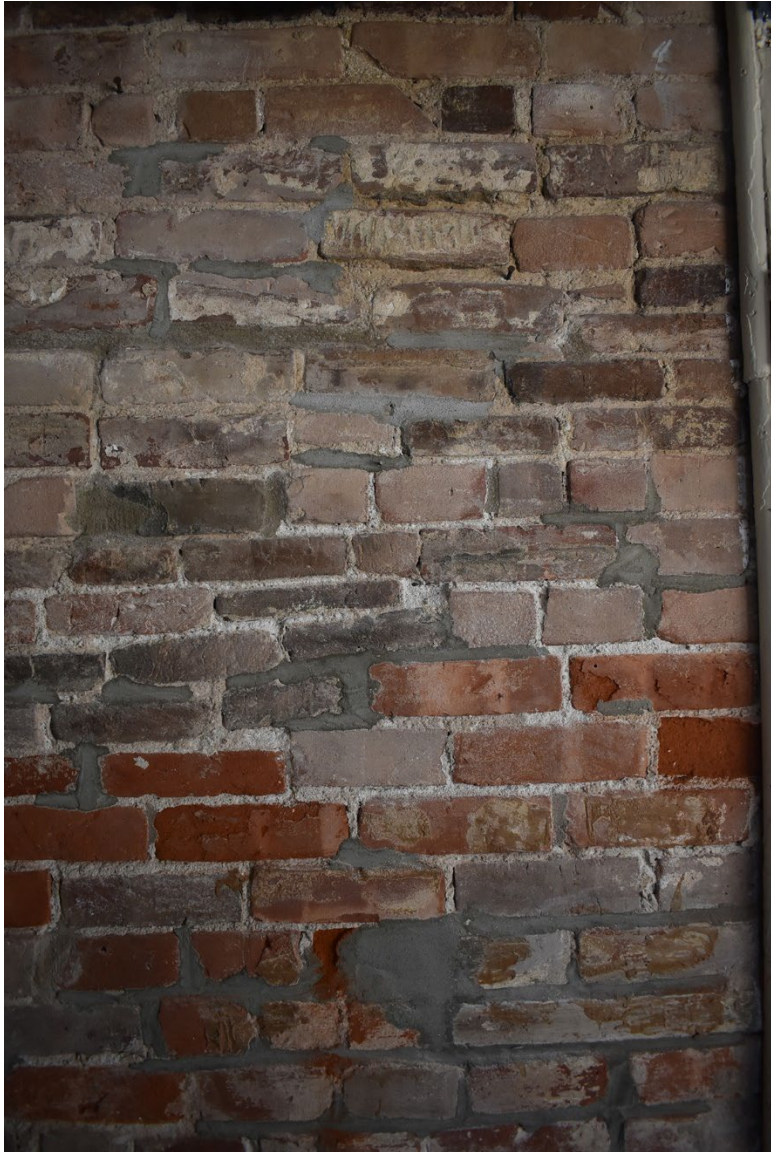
745 Bank Street, ground floor, interior north brick curved wall detail, view northeast.
